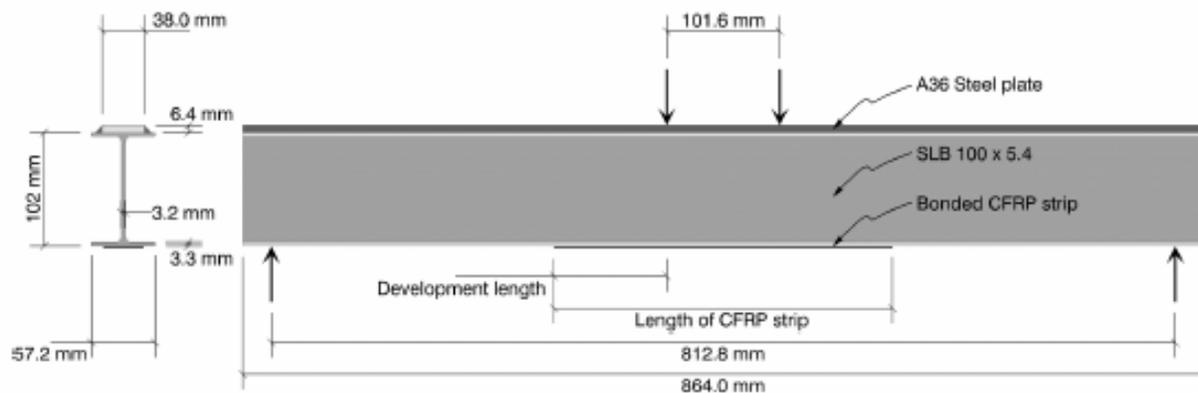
Typical test beam for selection of the structural adhesive (Schnerch, 2005)
